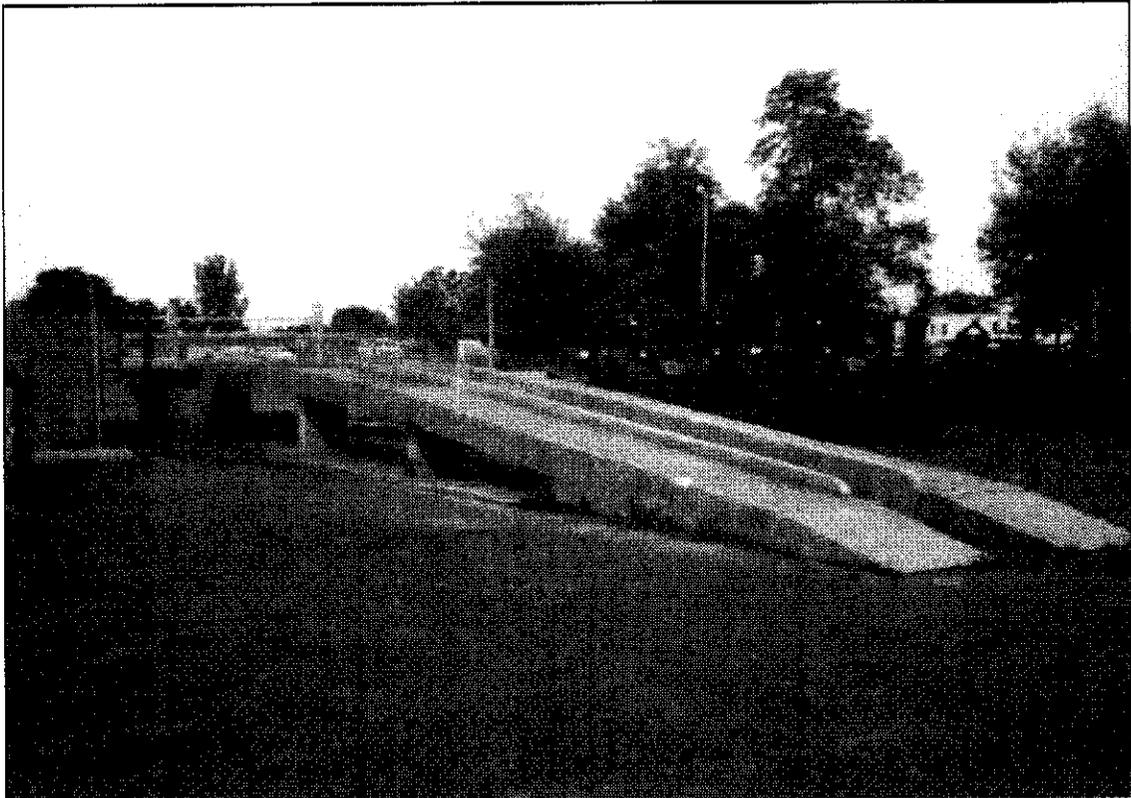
SSG Roy Clifton Scouten USARC Concrete Ramp, facing northeast.
